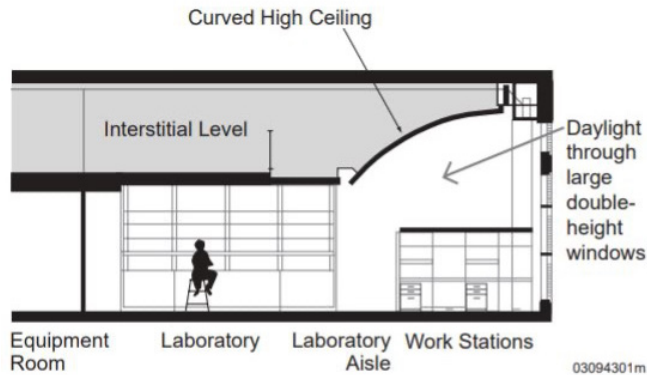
Cross section of laboratories and workstations shows daylighting through double-height windows. Source: HLM Design, Inc.
